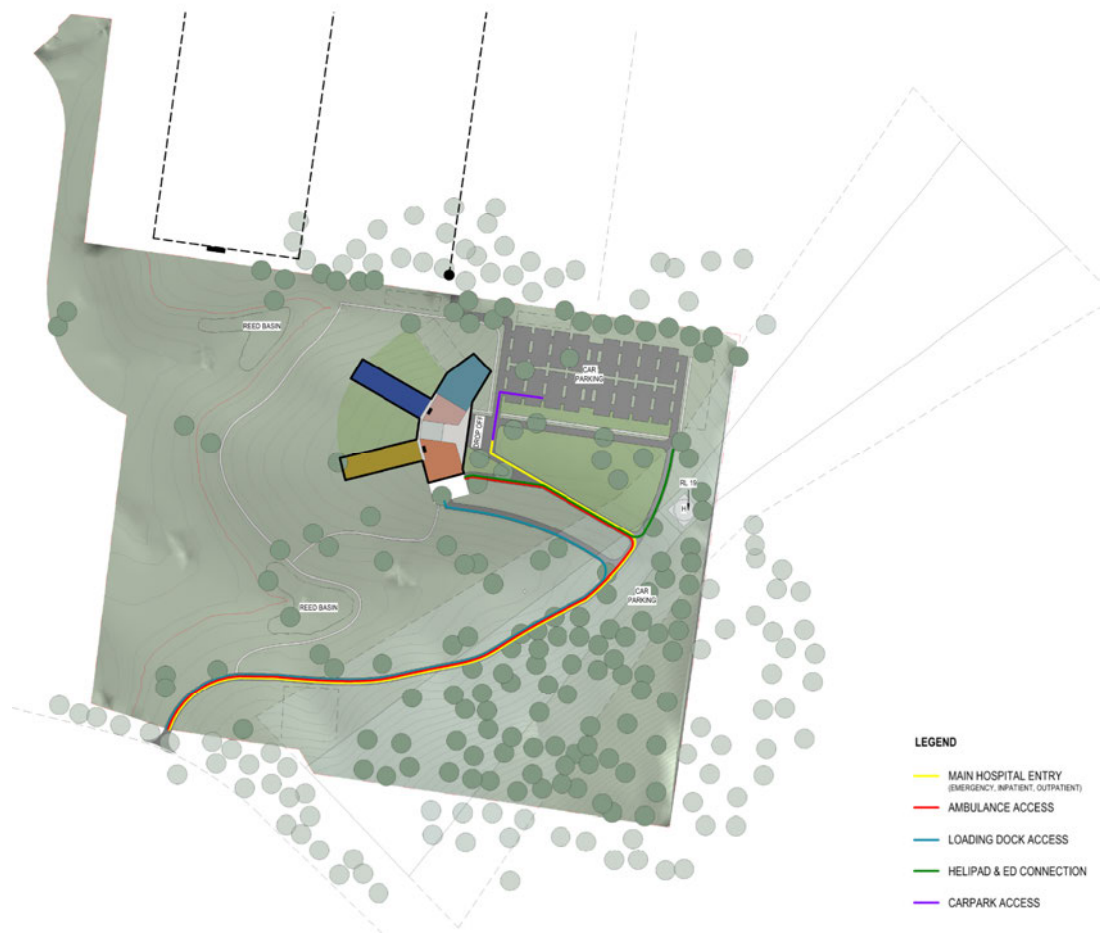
Architectural Masterplan - Option 1 (by Conrad Gargett)
